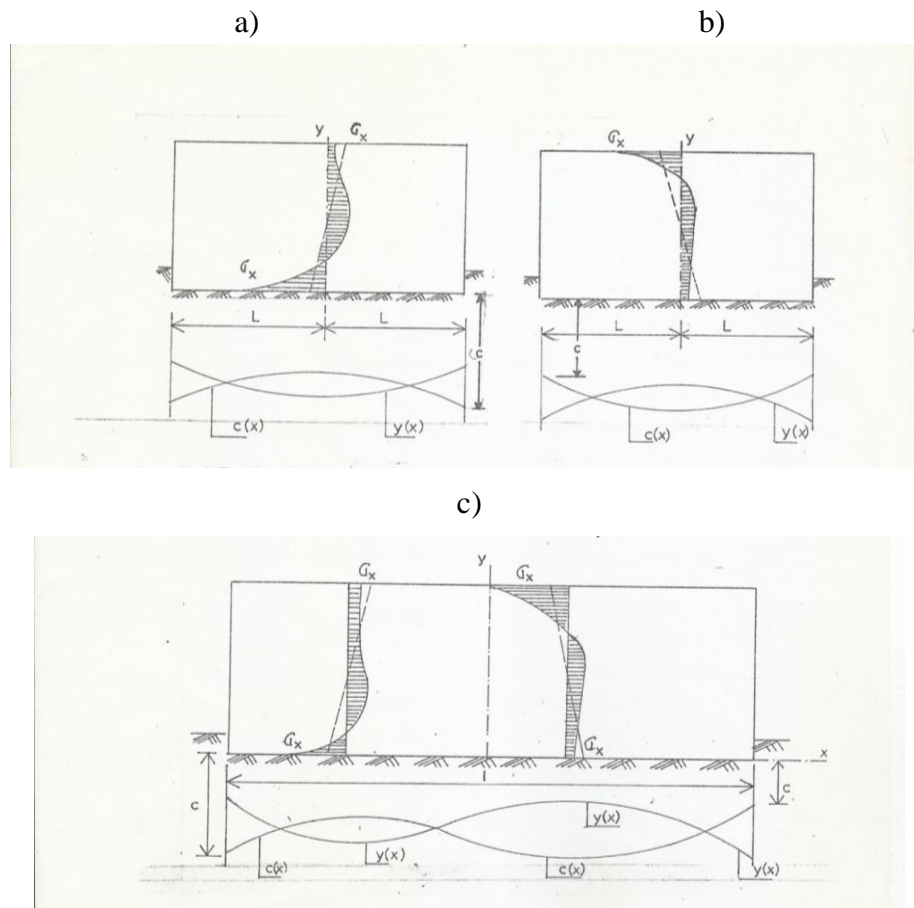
Damage in buildings due to settlement of foundation soils.
